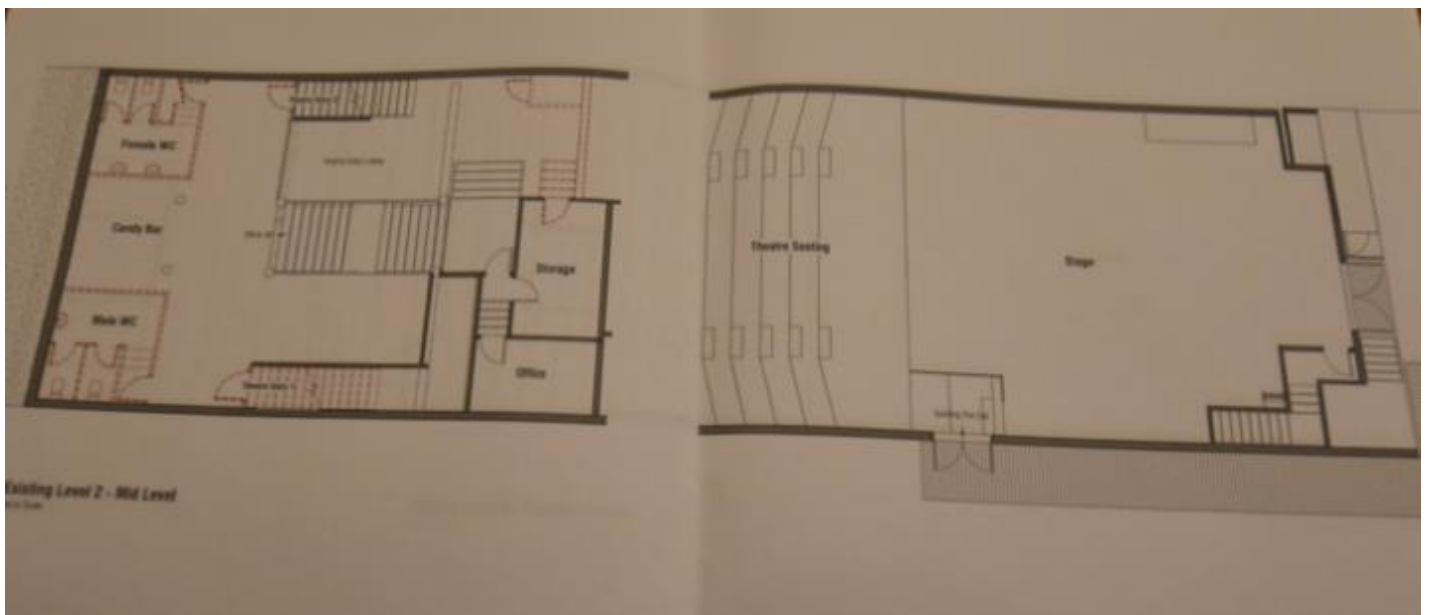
Mezzanine and stage level. Boon Team Architects, 2018. Stratford District Theatre Trust collection.
